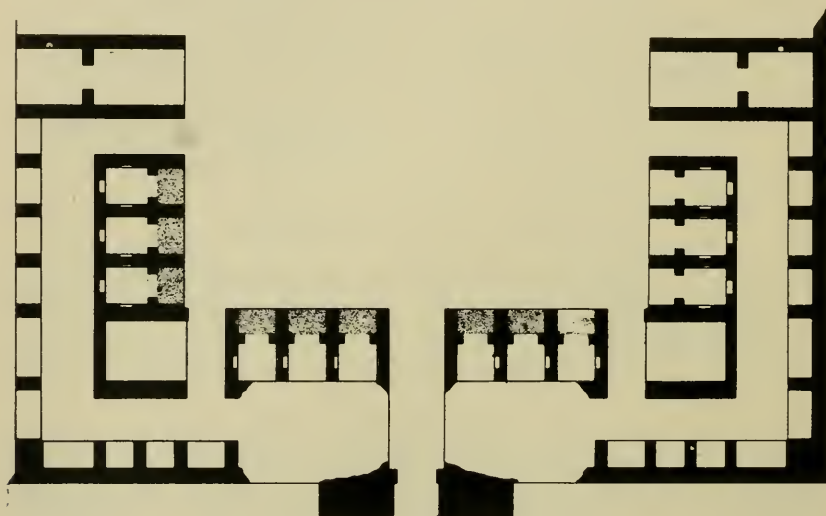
Plan of Yezd-i-Khast caravanserai.
